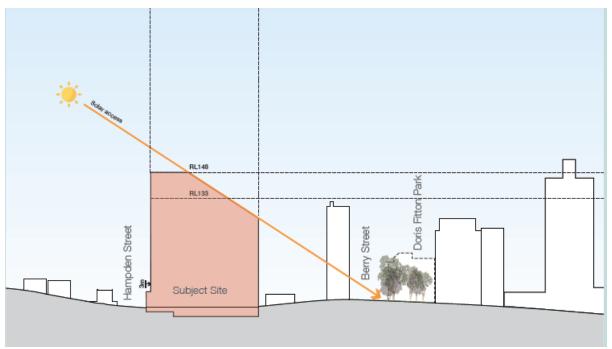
Proposed building envelope achievable showing solar access plane to Doris Fitton Park (Source: SJB).
